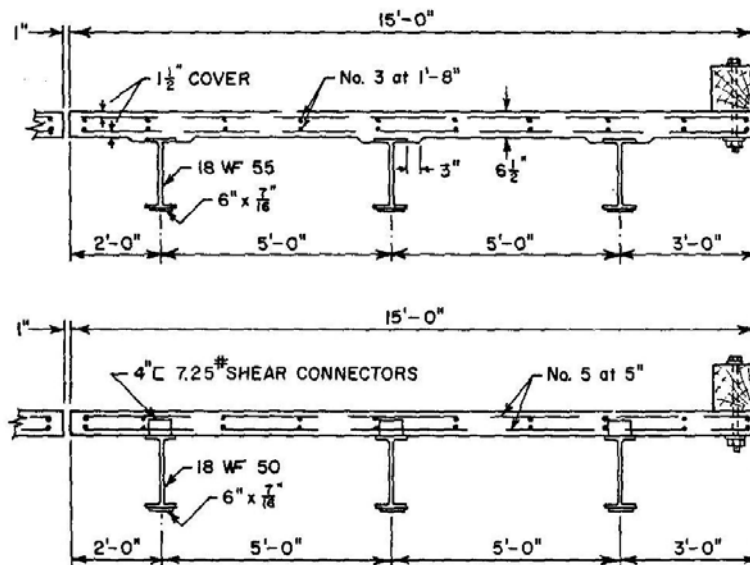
Transverse View of Typical Road Test Bridge (AASHO 1962)
